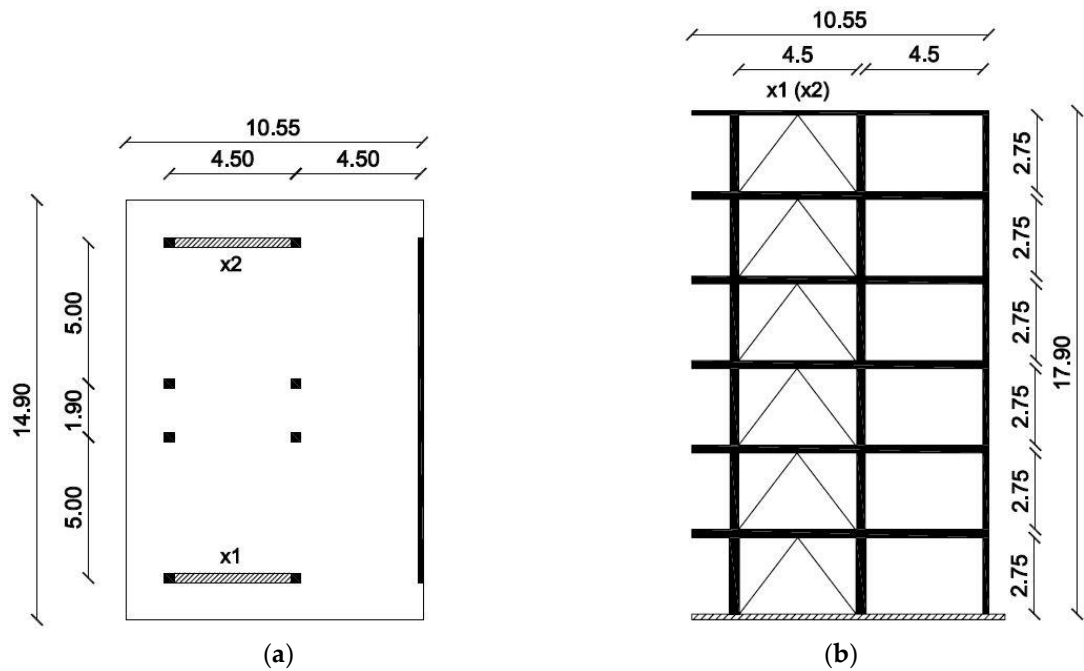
Distribution of Jarret device in: (a) plan and (b) elevation.
